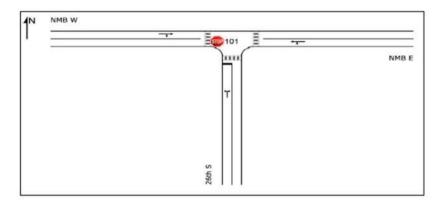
Proposed intersections layouts for acceptable LOS levels
